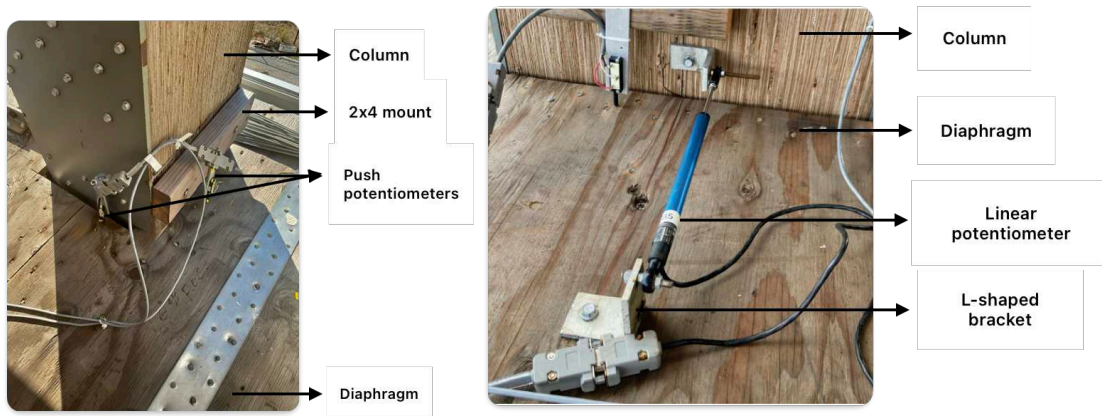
Instrumentation Detail at Column Diaphragm Connection
